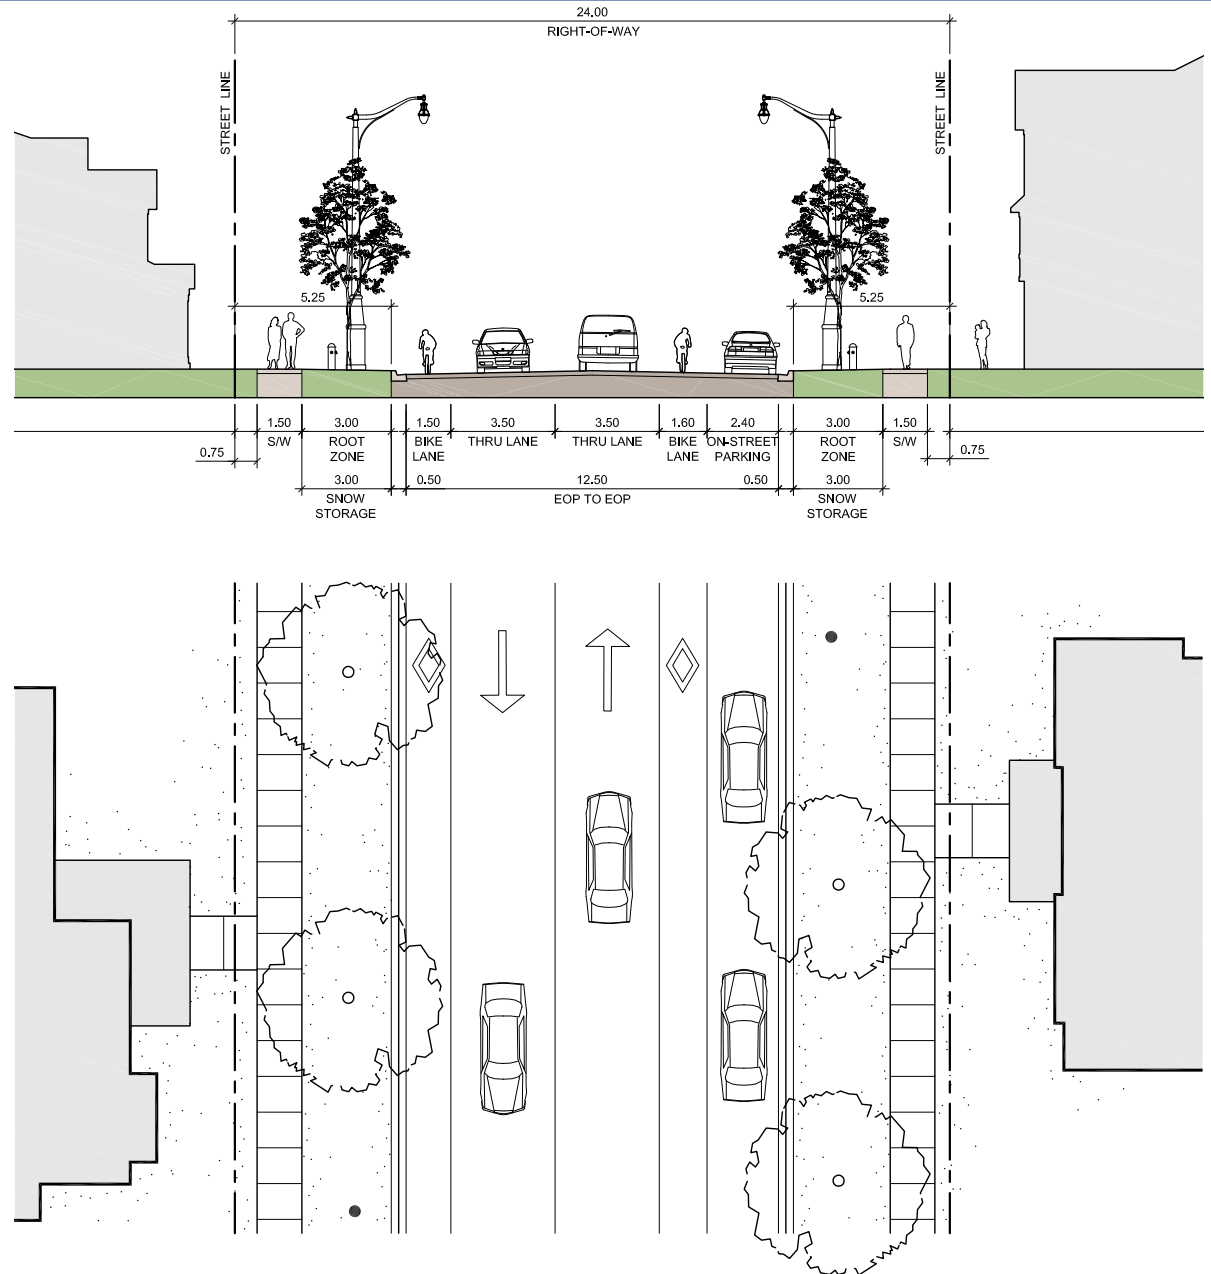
24.0m R.O.W. Minor Collector Road - 2 thru lanes / on-street parking / dedicated bike lanes. Reflects current Brampton Minor Collector Road Standard Dwg. #216.
